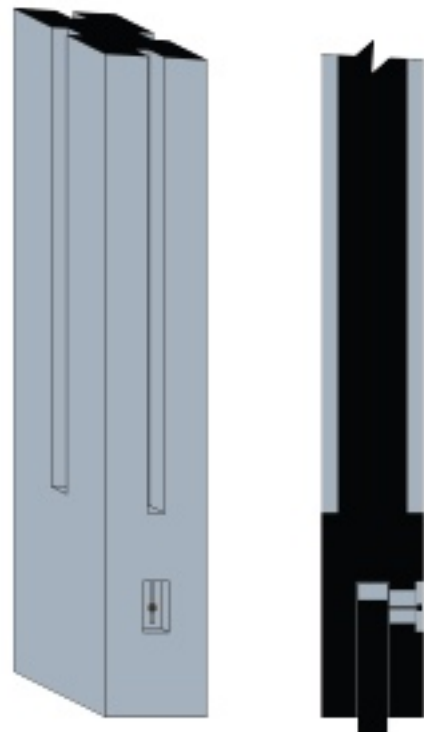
Post Axon and Section Showing Floor Lock and Groove
